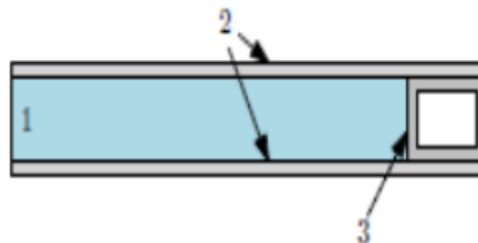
Cross –section view of typical sandwich section for the C20 FICAS [7]
